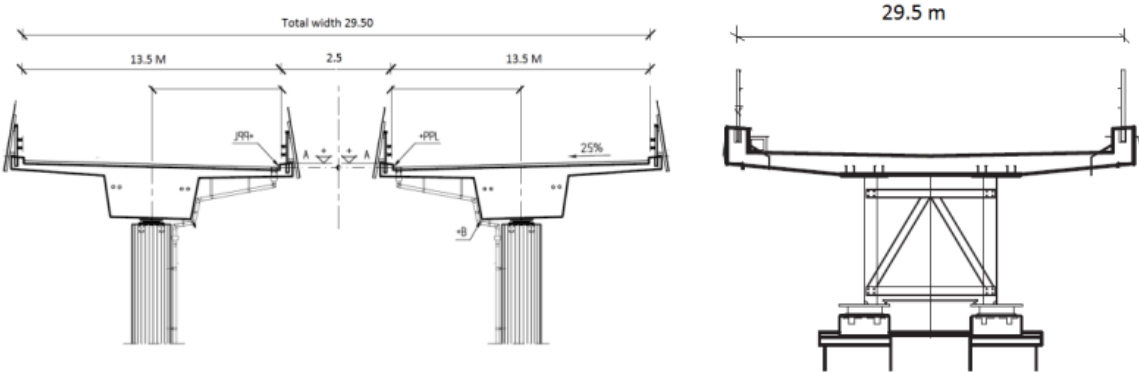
Cross section for the case study of Nacka bridge. Left) Concrete deck bridge, Right) I-girder steel hybrid bridge [64]
